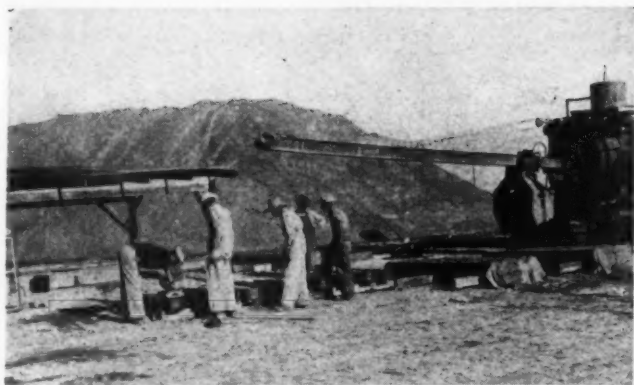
Making pilot test beams at the plant. Curing vat is under shed in background
